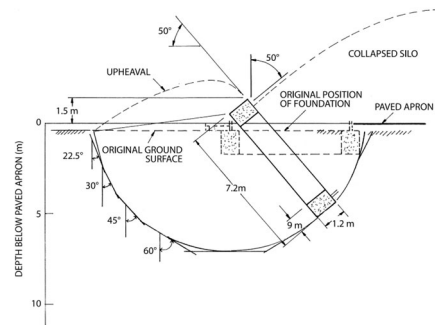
Silo foundation after failure, Vankleek Hill (after Bozozuk 1972)
